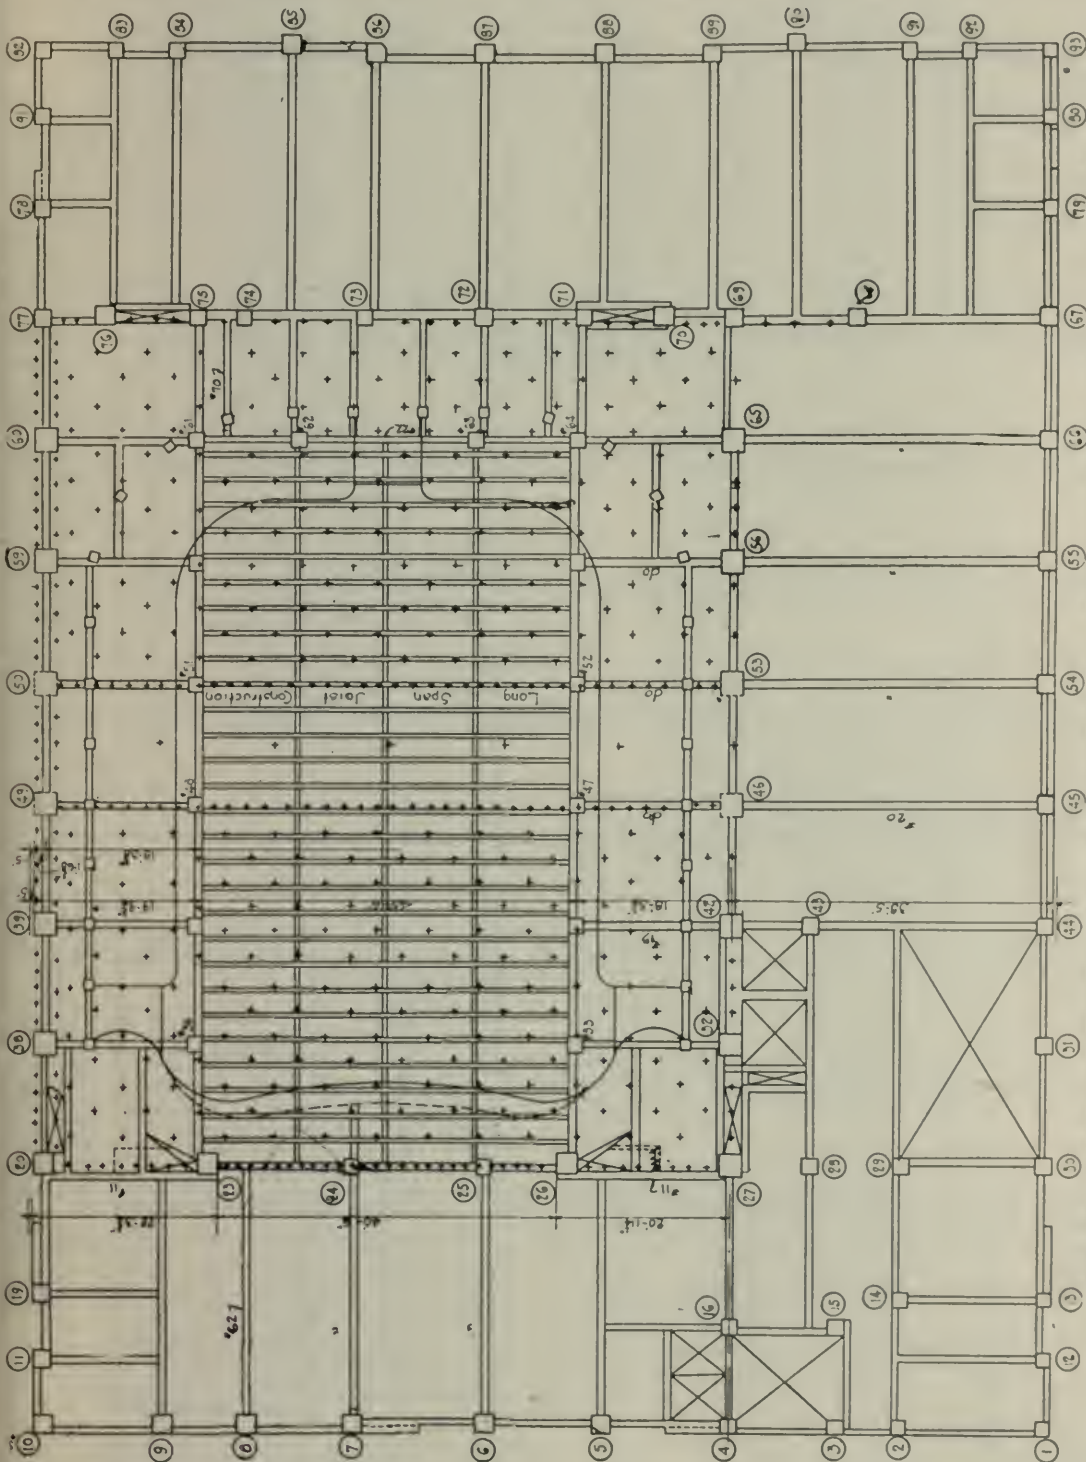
Plan of the auditorium floor of the Temple, upon which rested the shoring shown in Fig. 12. It will be noted that the joist construction of this floor ran in the opposite direction to that of the floor above and that many of the shores supporting the floor above rested on the beams and slabs of the short span construction around three sides of this auditorium floor. It will also be noted that concentrated lines of shoring, under the two truss chords, rested directly over two of the joists of the long span portion of the auditorium floor.
